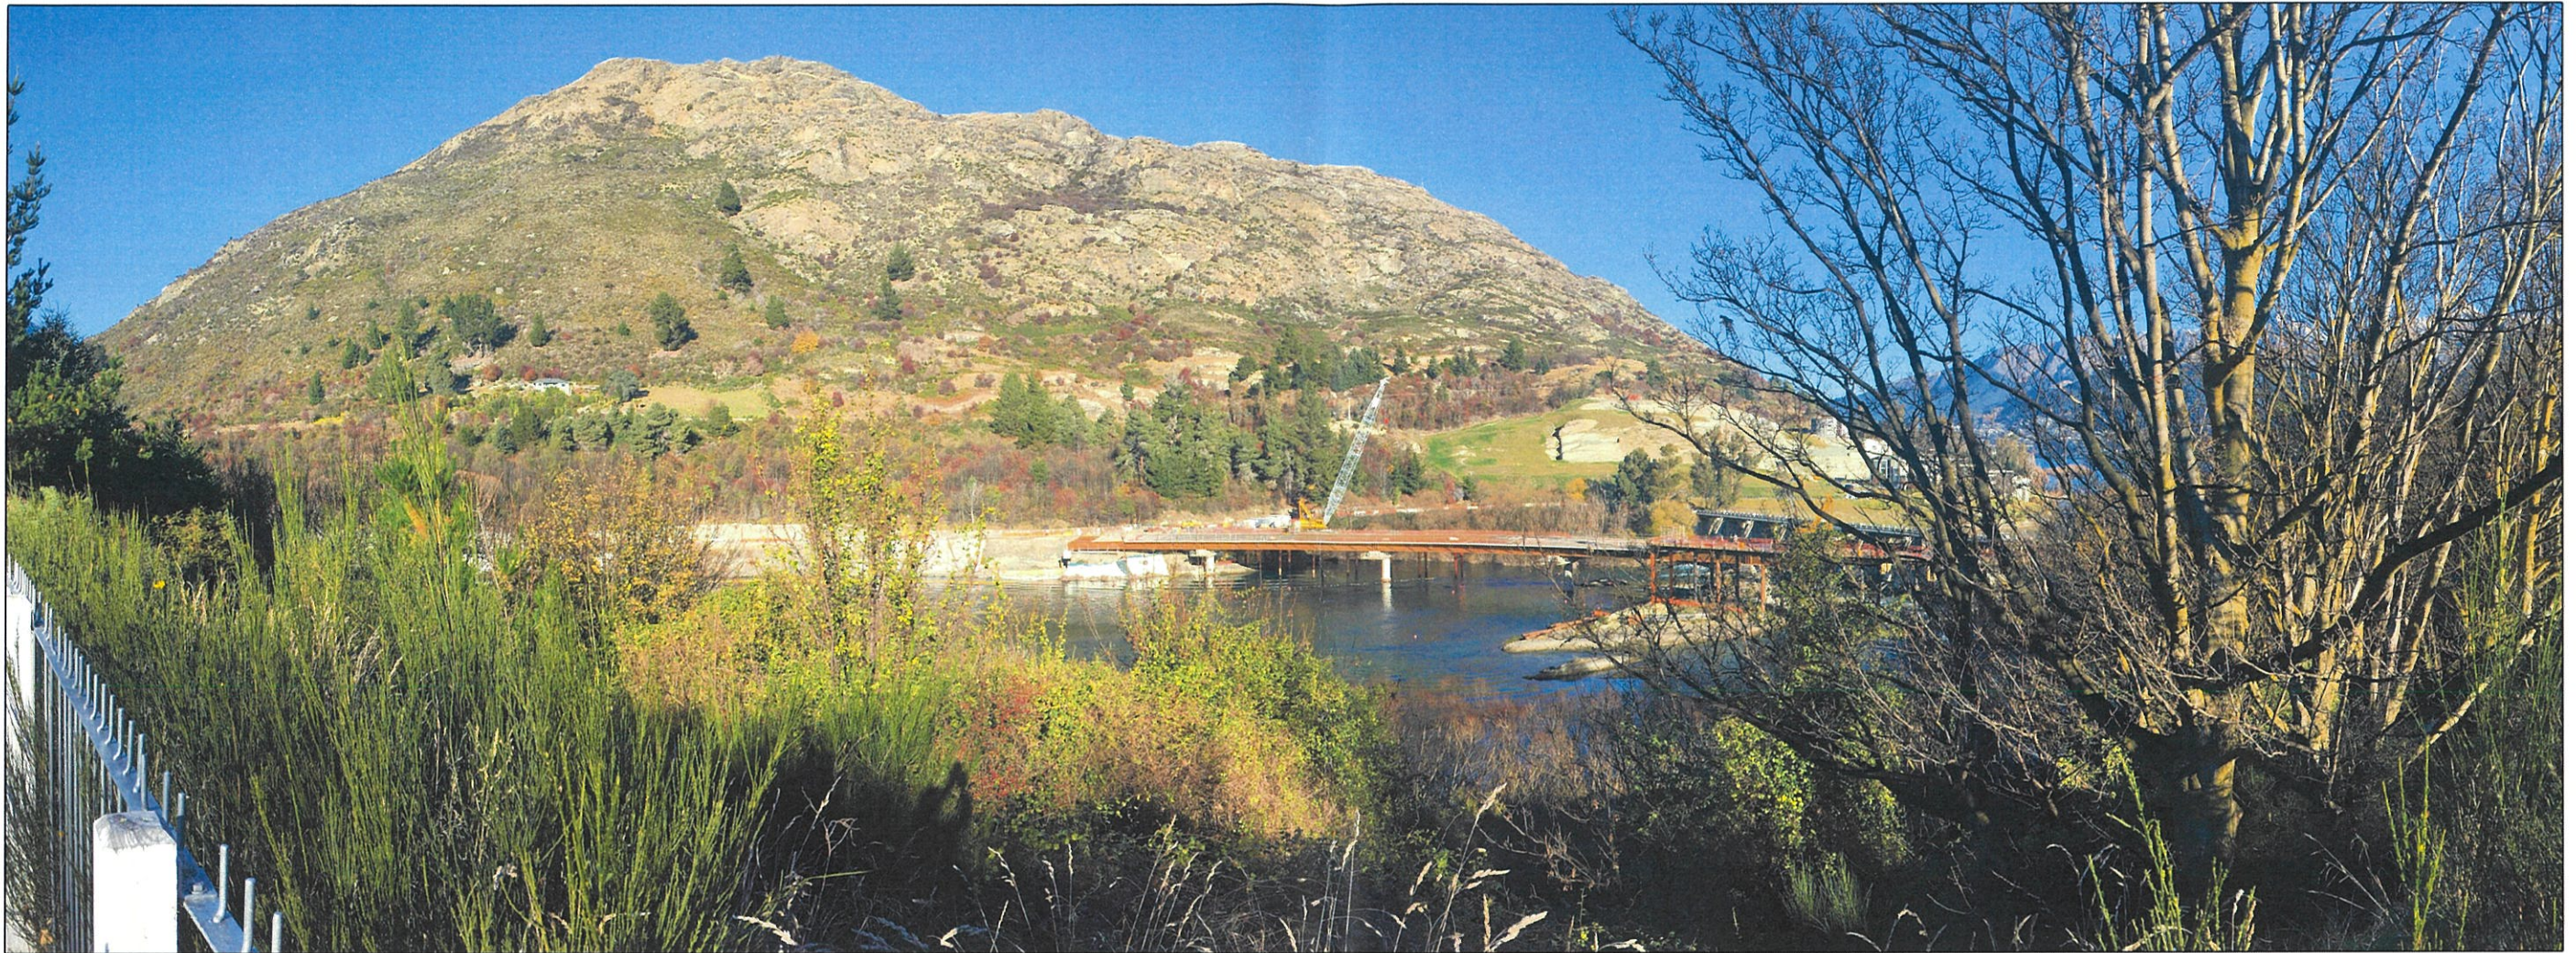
WALKWAY OFF ROBERTSON ST BY KINDERGARTEN
